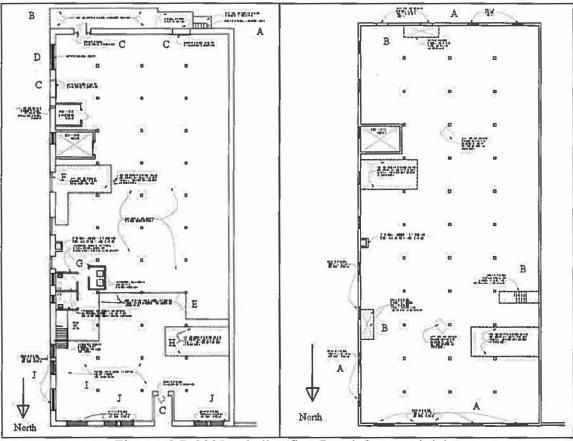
as-built floor plans, third (left) and fourth (right) floors (Property Abstract, 2005)
